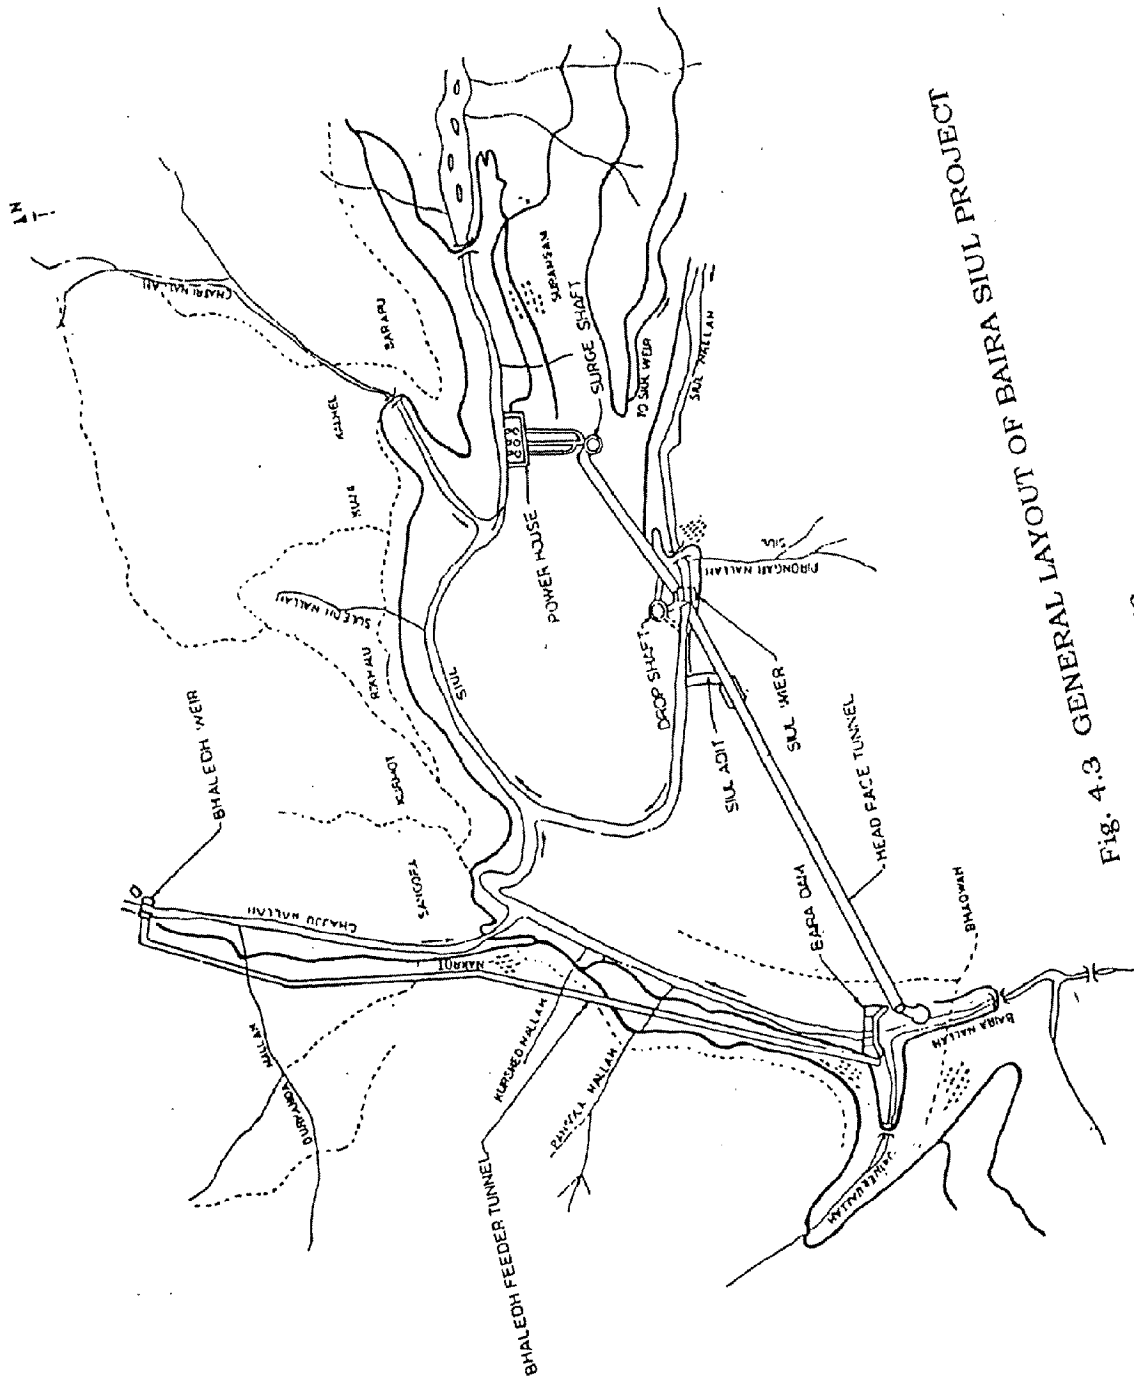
GENERAL LAYOUT OF BAIRA SIUL PROJECT
